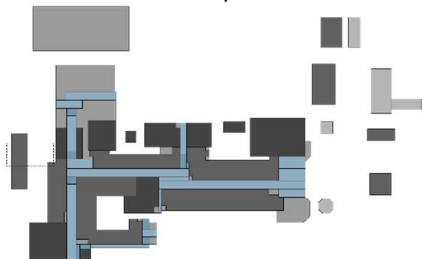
Winkelcentrum Schalkwijk renovation, new roofing, additional buildings, 1990-1993 (own illustration)
